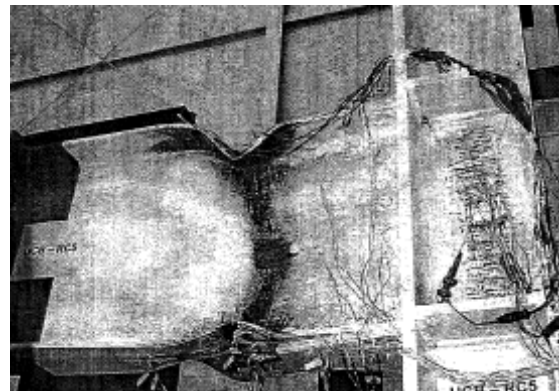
Free Flange connection failure modes a) Plastic hinge in the beam at 4% drift
